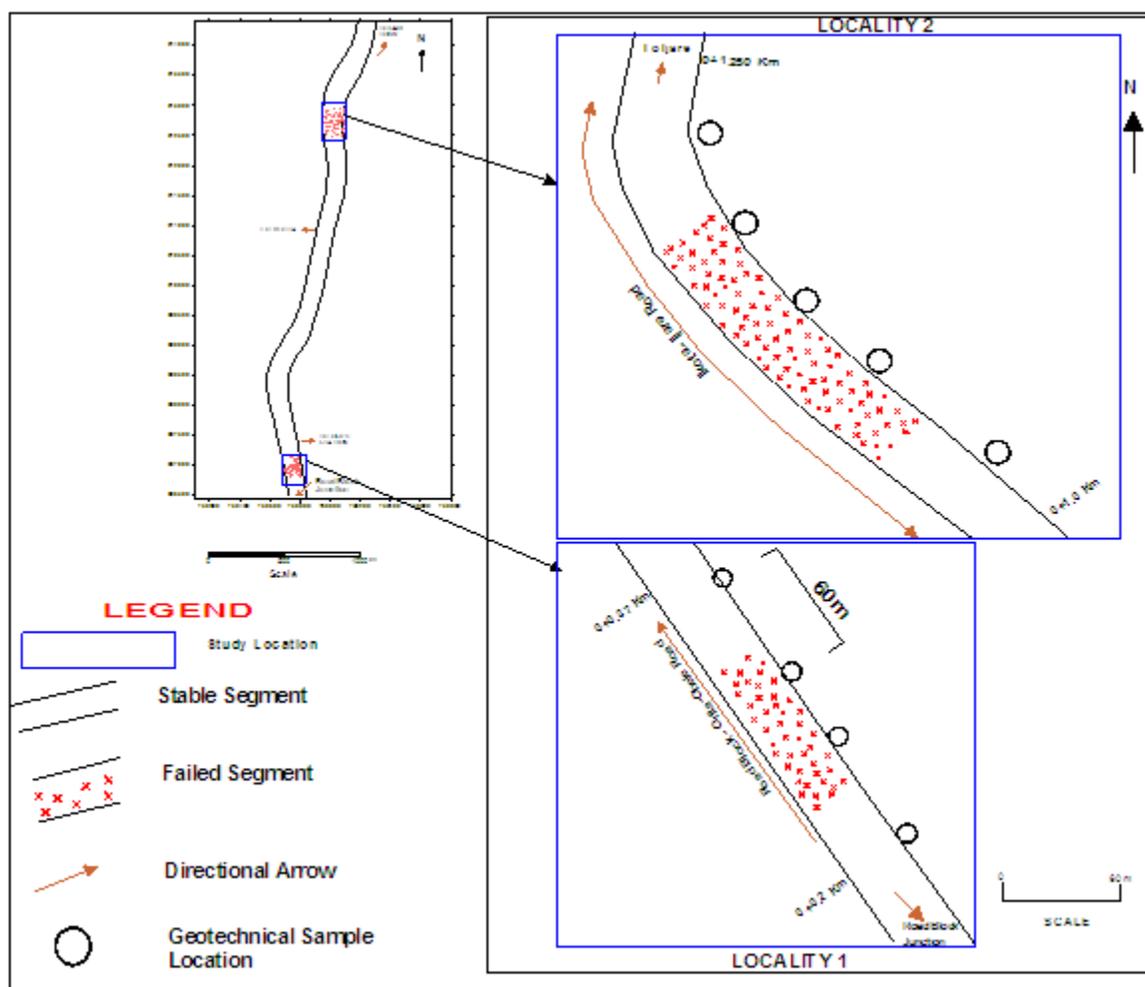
Field Layout at Locality 1 and 2 Showing Geotechnical Sampling points.
